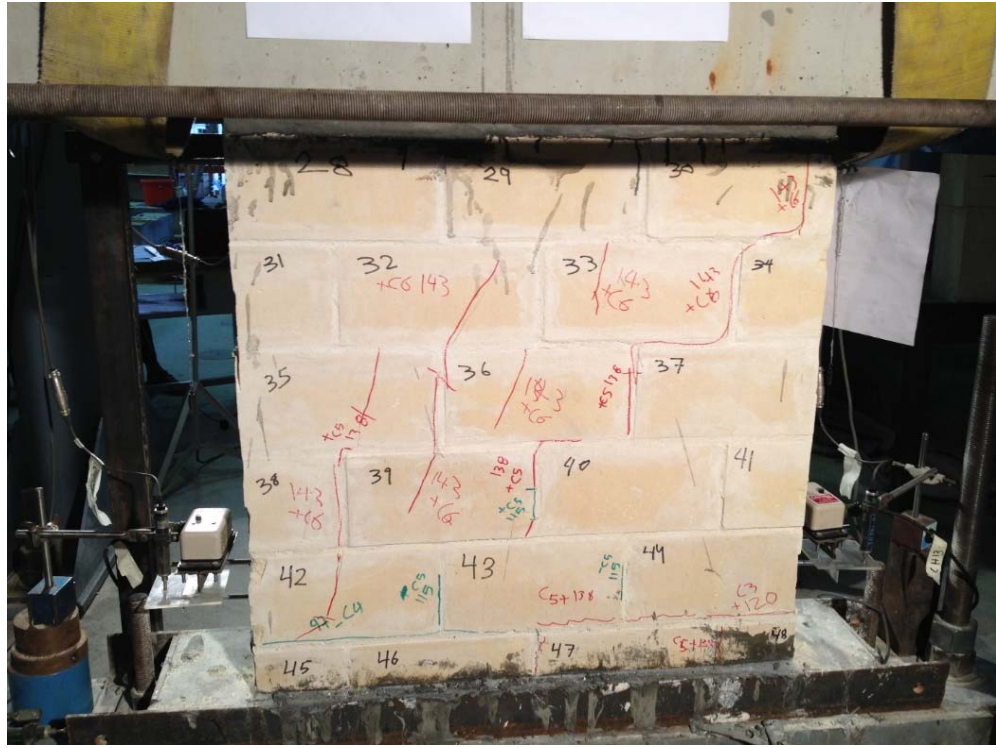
Damage associated with 9.8 mm push loading (back side) Wall-1.7
